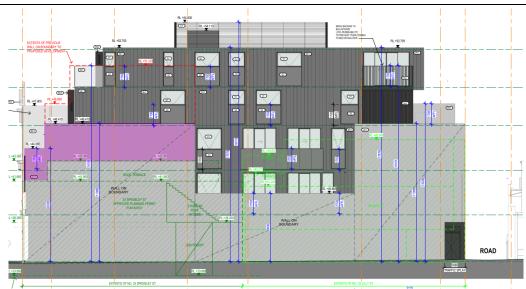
The proposed western elevation, with the exposed concrete wall shown in pink
